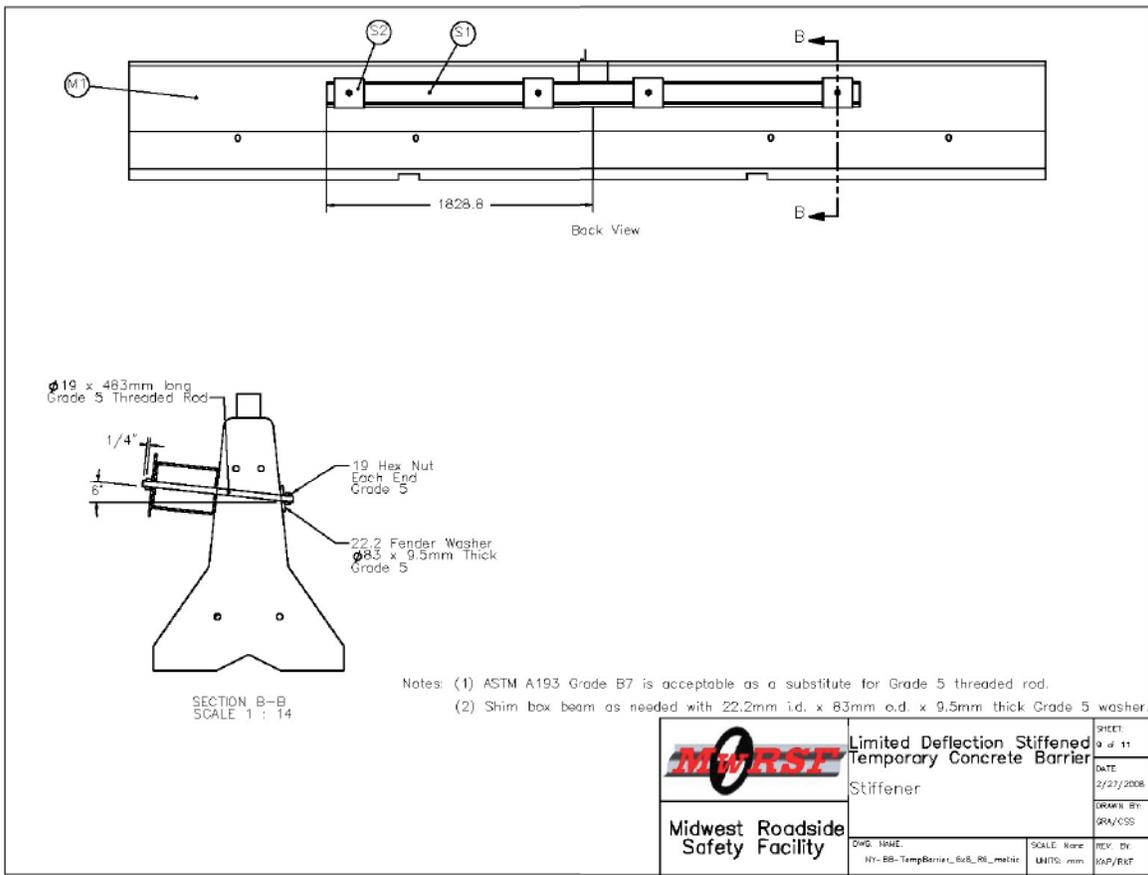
Box Beam Stiffener Details, Test NYTCB-3
